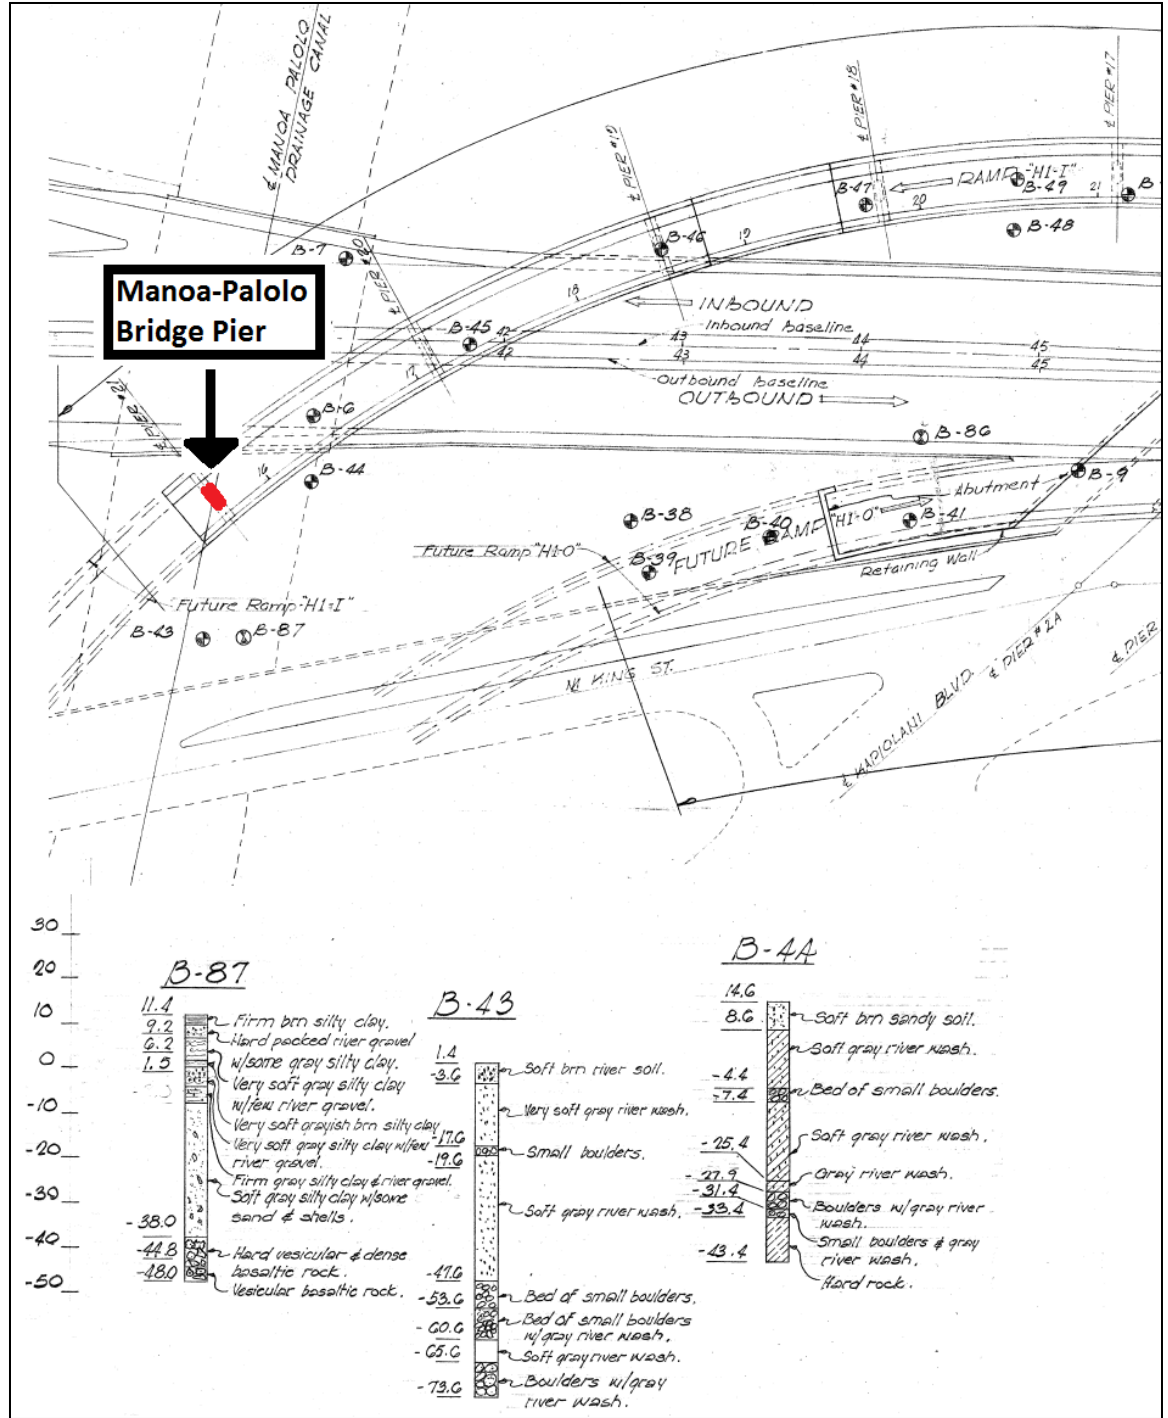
Boring logs from as-built plans of the Manoa-Palolo Bridge Pier, completed in 1965 by the Hawaii Department of Transportation
